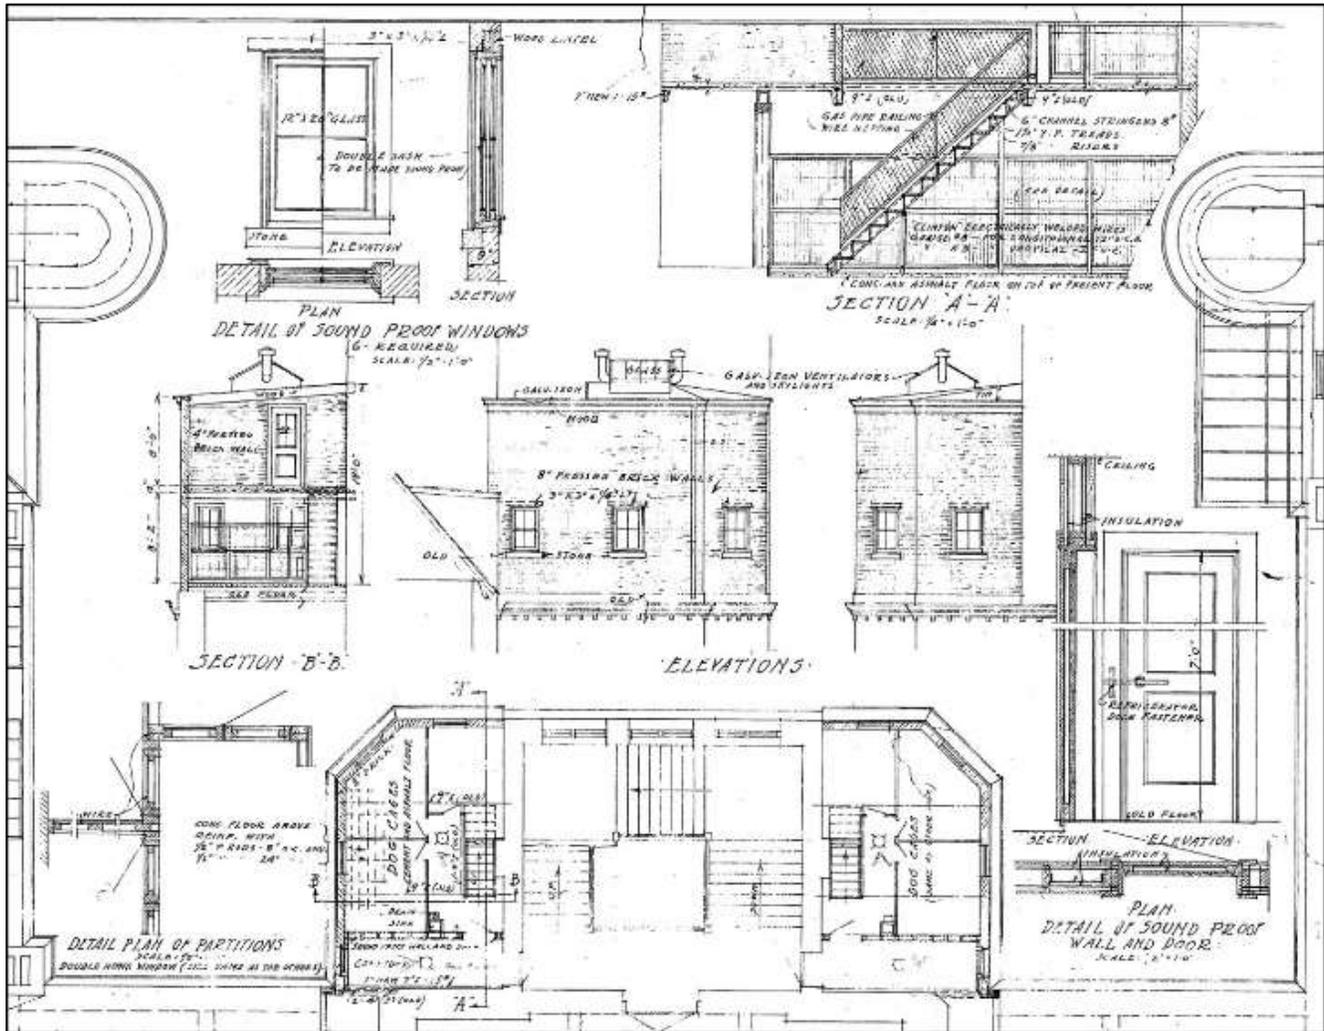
1917 Science Hall renovation plans, fourth floor, showing construction details for the dog rooms. Source: University of Wisconsin-Madison Facilities Planning & Management.
